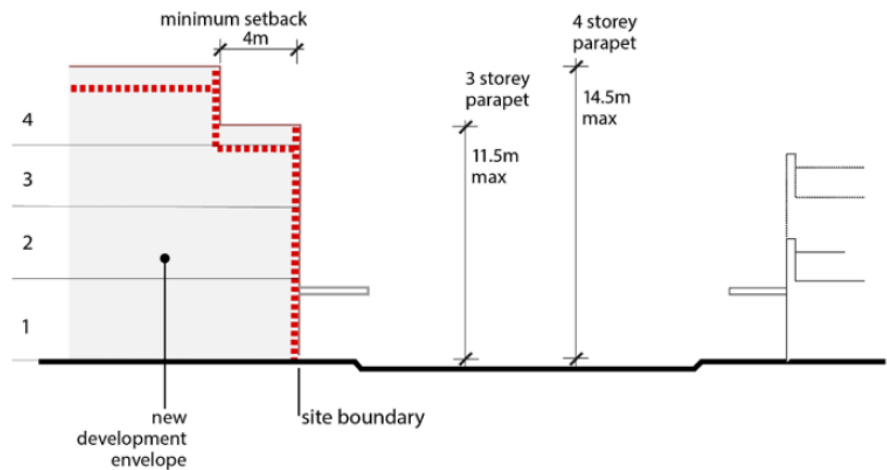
Front setbacks for new buildings in Area 2 (source: Exhibited DDO21)
